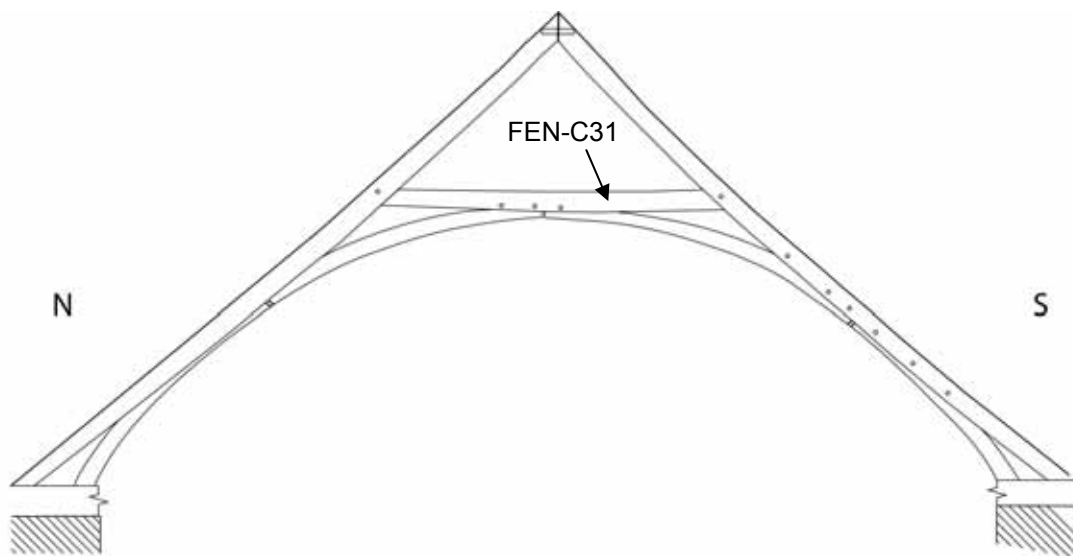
Frame 11, showing the location of sample FEN-C31 (based on a drawing provided by John Allen)
